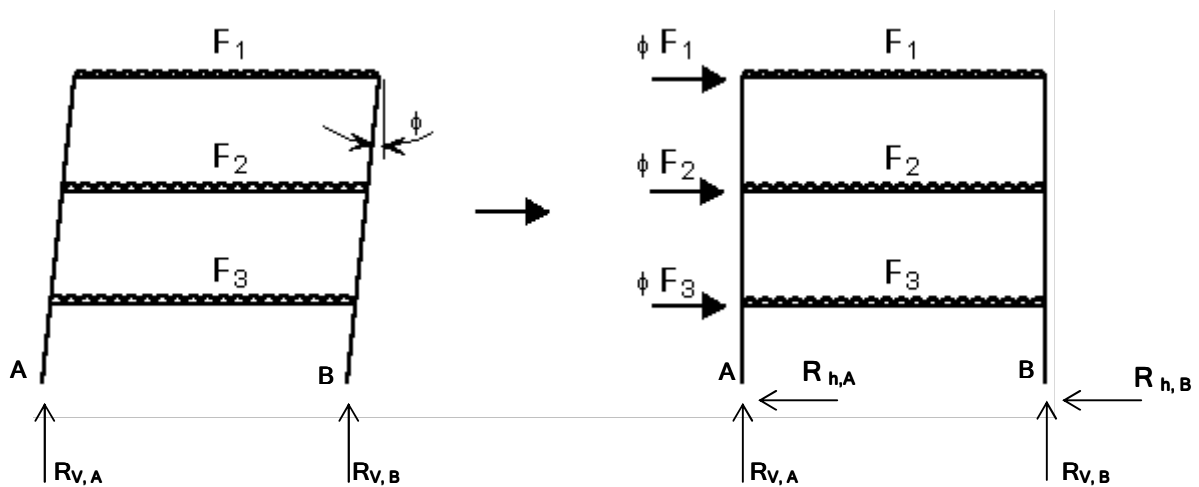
Equivalent horizontal forces in beam-and-column building frames
